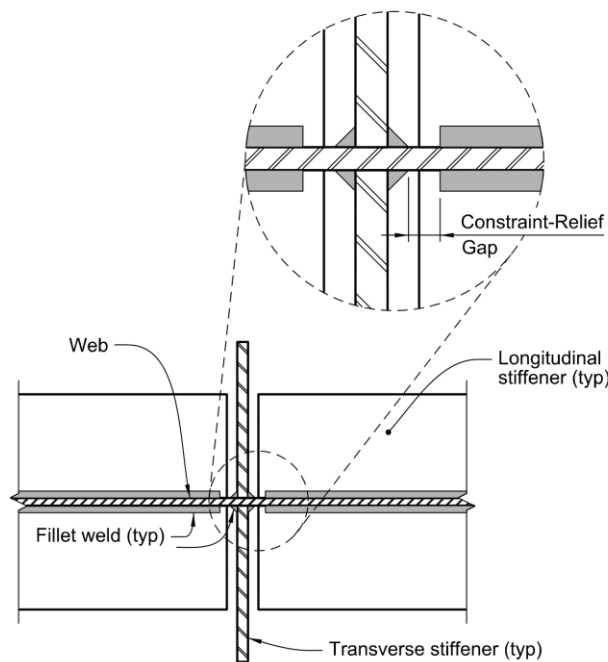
Plan view of girder web with attached transverse and longitudinal stiffeners.
